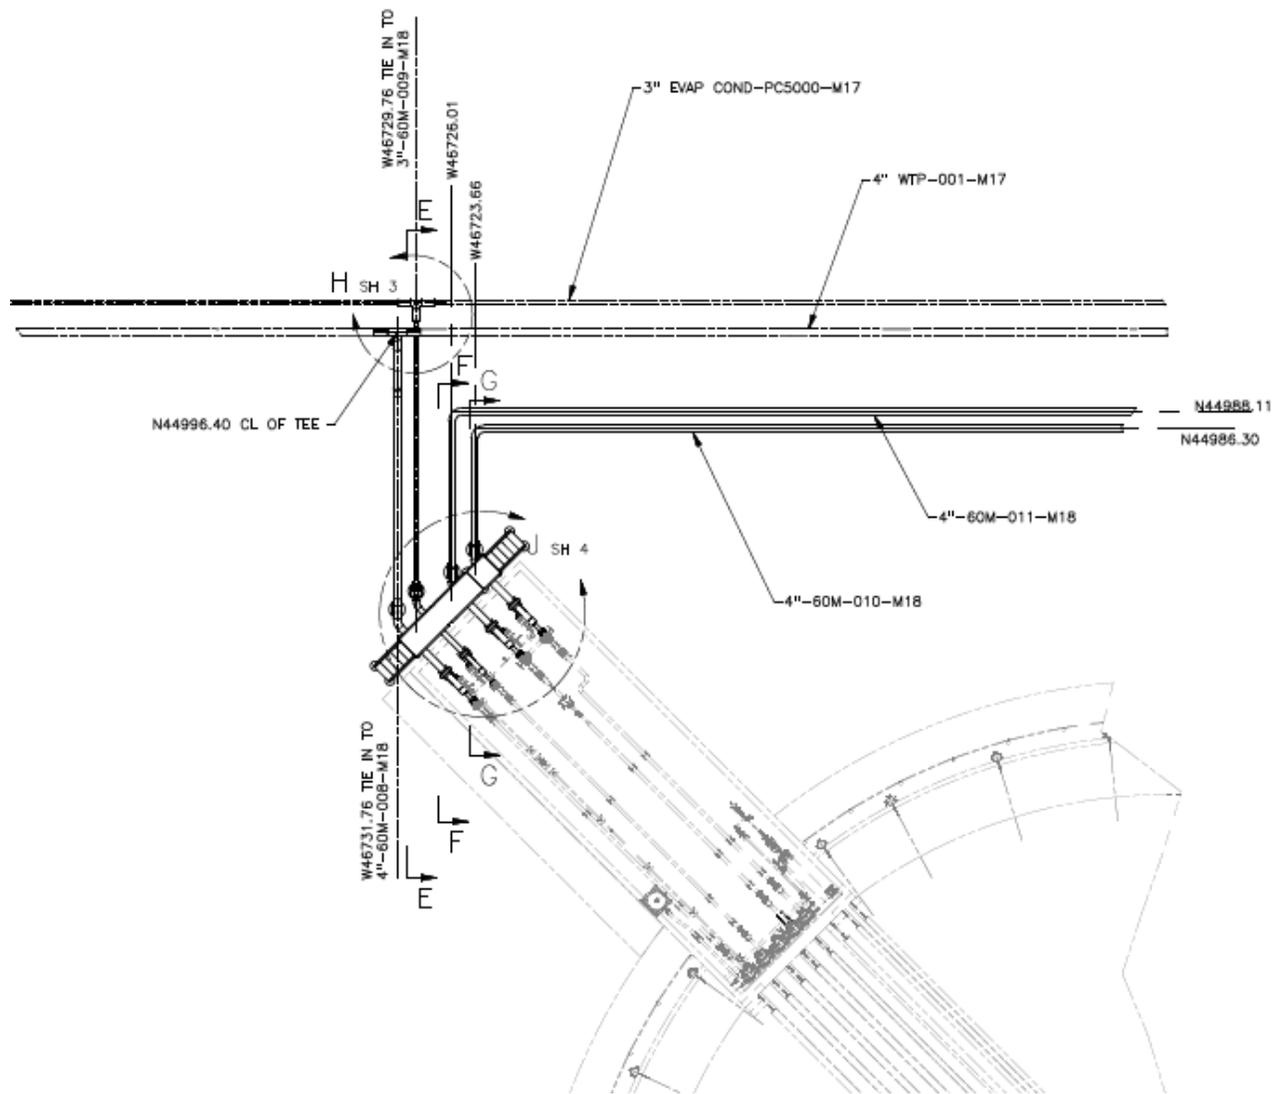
LERF Basin 41 Piping Detail-B (H-2-838765, Sheet 2)
